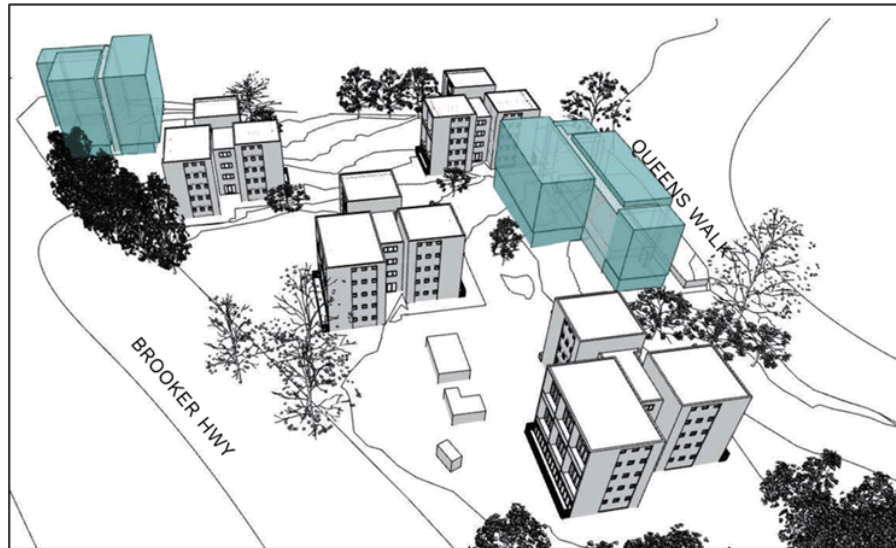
Massing study showing the proposed buildings integrating with the existing site patterns of form, outlook and alignment. Building E is to the top left; Building F to the right. (Source: Cumulus).
